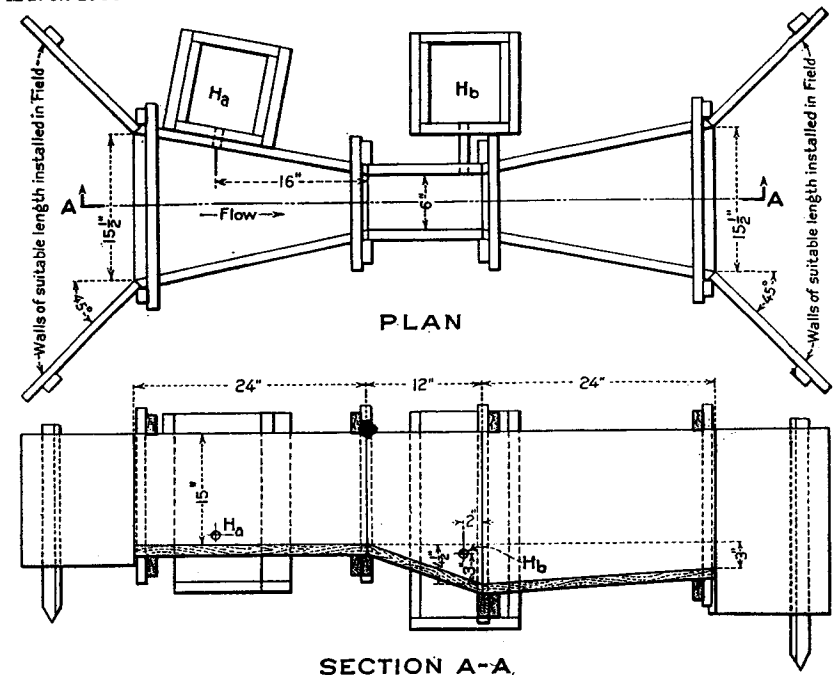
Plan and elevation of the 6-inch Parshall measuring flume.
